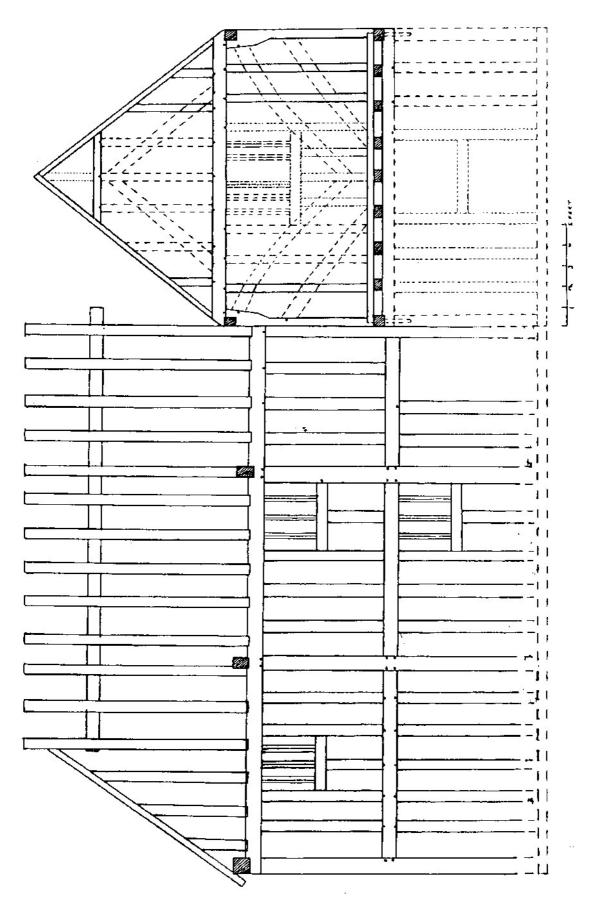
Mascotts, Copford: Reconstruction of southern elevation c1600 AD
